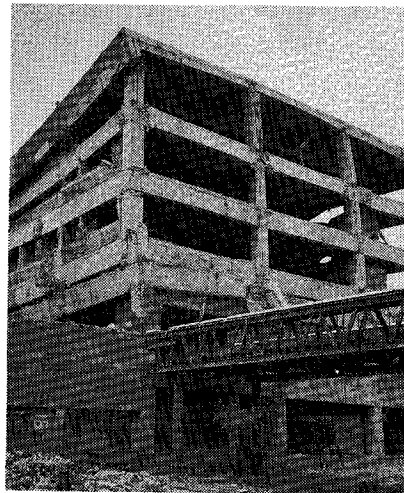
Cracks in a Concrete Frame (Mexico Earthquake 1985).
